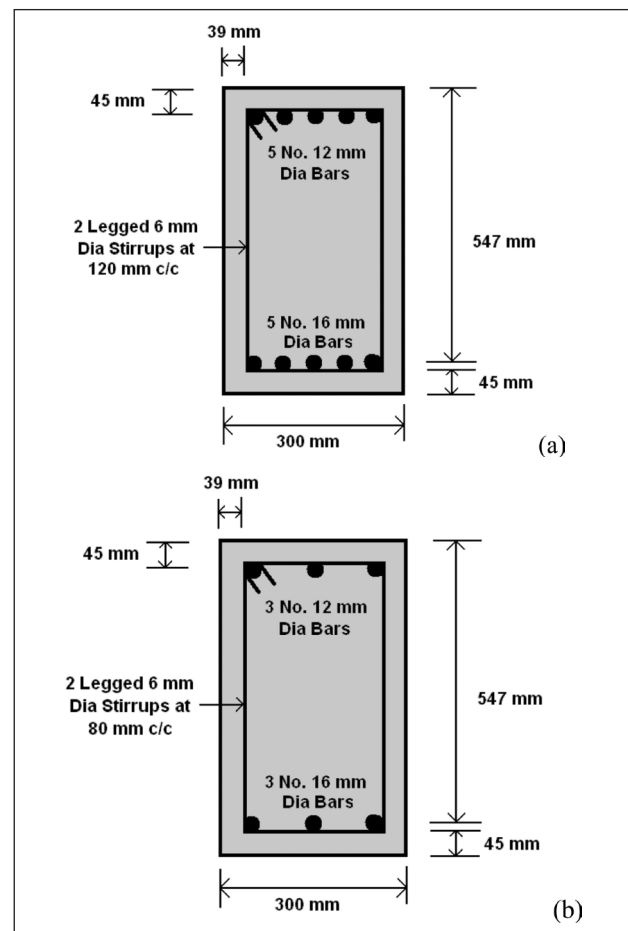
Typical RC beam cross-section: (a) at mid span, (b) at supports
